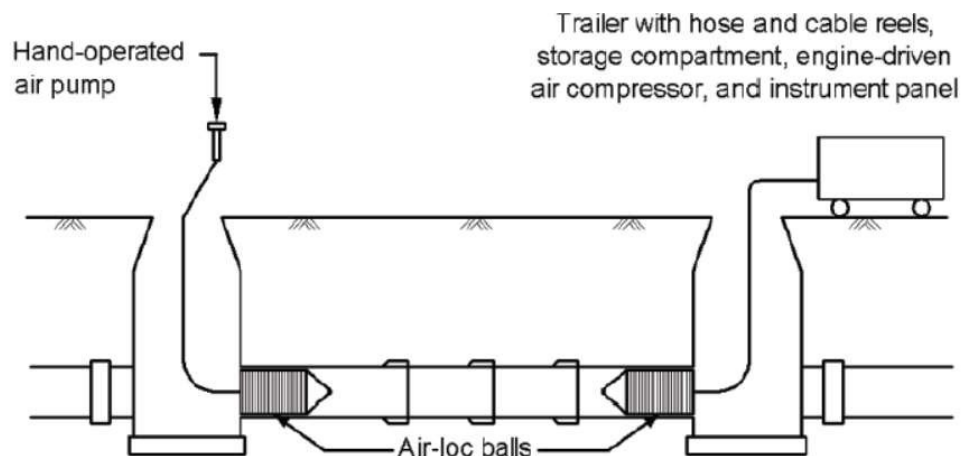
Typical arrangement for low pressure air testing of sewer pipeline
